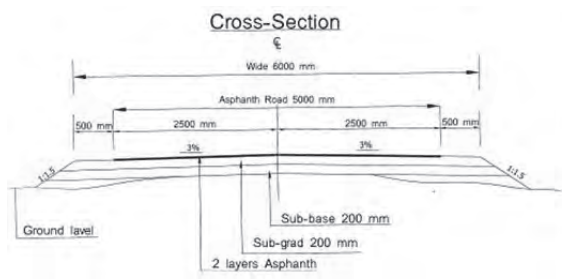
Improvement plan of infrastructure at KM8 existing final disposal site
